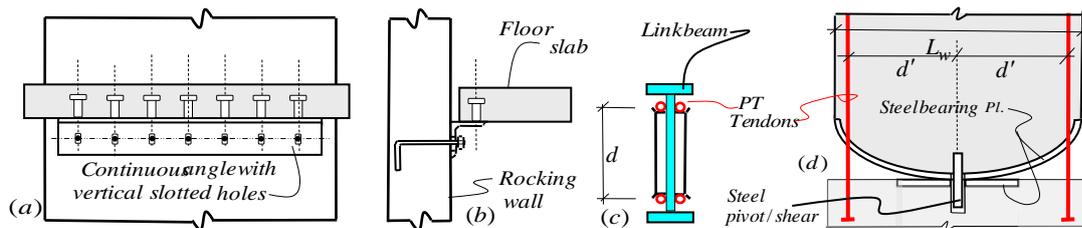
(a) and (b) Wall-slab shear connection, (c) LB section, (d) Rocking wall base and cables
